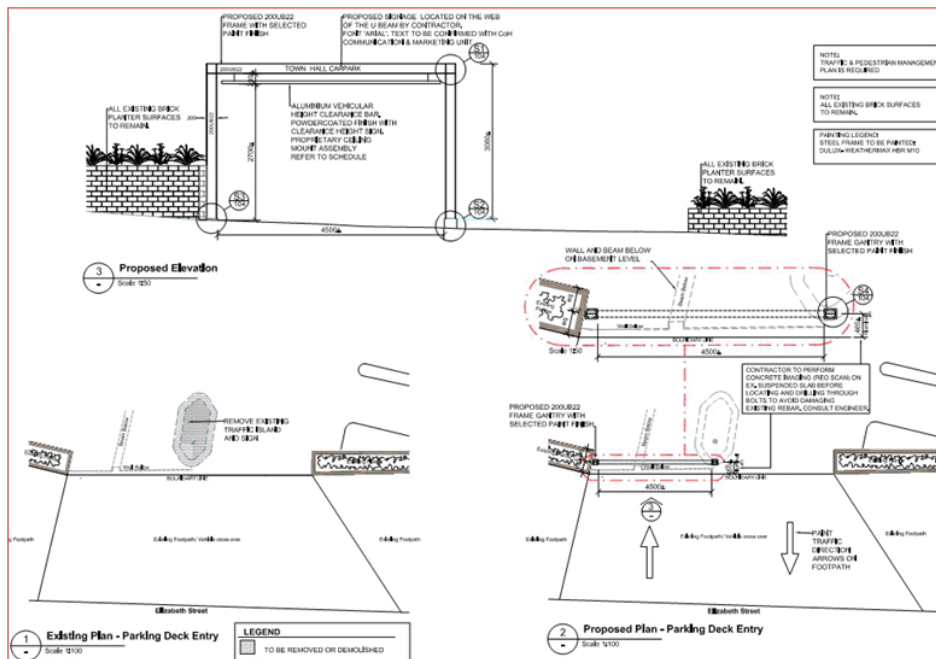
Existing and proposed parking deck entry and proposed elevation
